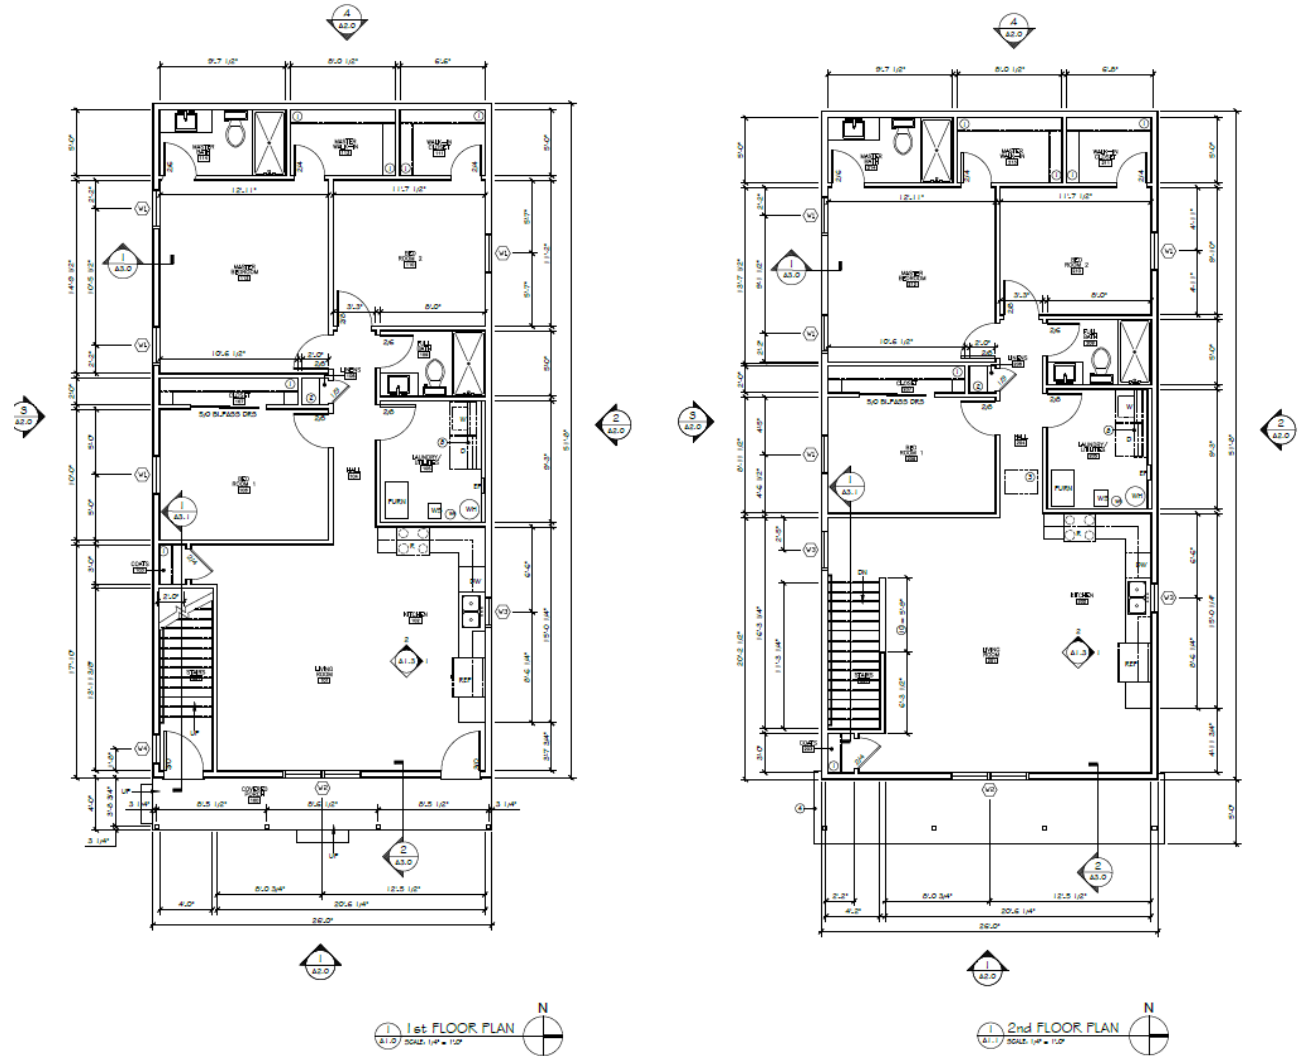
Floor plans of the two apartments of the proposed duplex.
